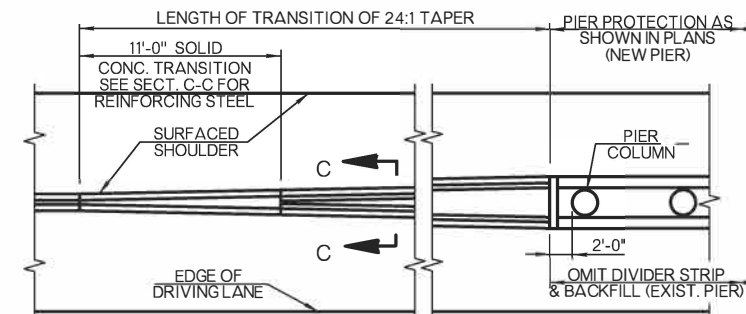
DETAIL OF TRANSITION SECTION AT BRIDGE ENDS
